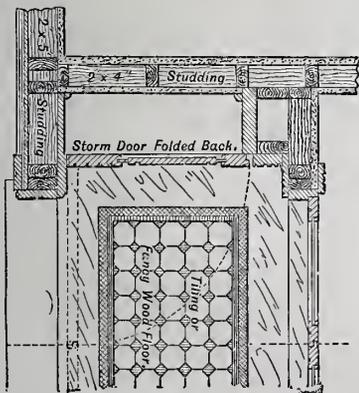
Plan of Vestibule showing Storm Door Folded Back.—Scale, 3/8 Inch to the Foot.
